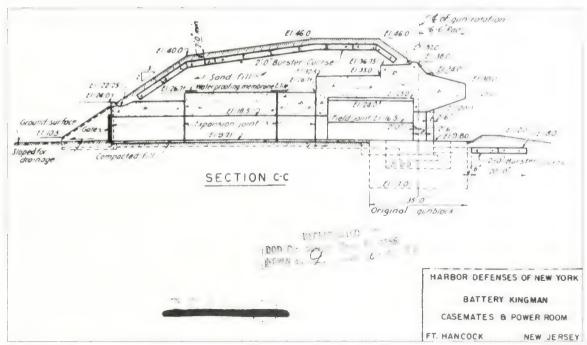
Section through Battery Kingman's emplacement #2, 1944. Two of the protective measures added to Batteries Kingman and Mills were concrete canopies that extended over the gun platforms and a concrete burster course intended to denote a bomb near the surface of the casemate before it could penetrate deeper into the earthwork and cause more damage (Report of Completed Works, CDSG ePress).
